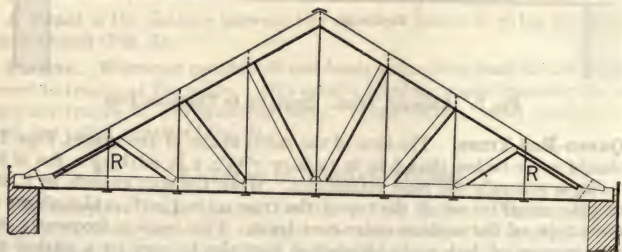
Eight-panel Triangular Howe Truss. Spans from Forty-eight to Sixty Feet
